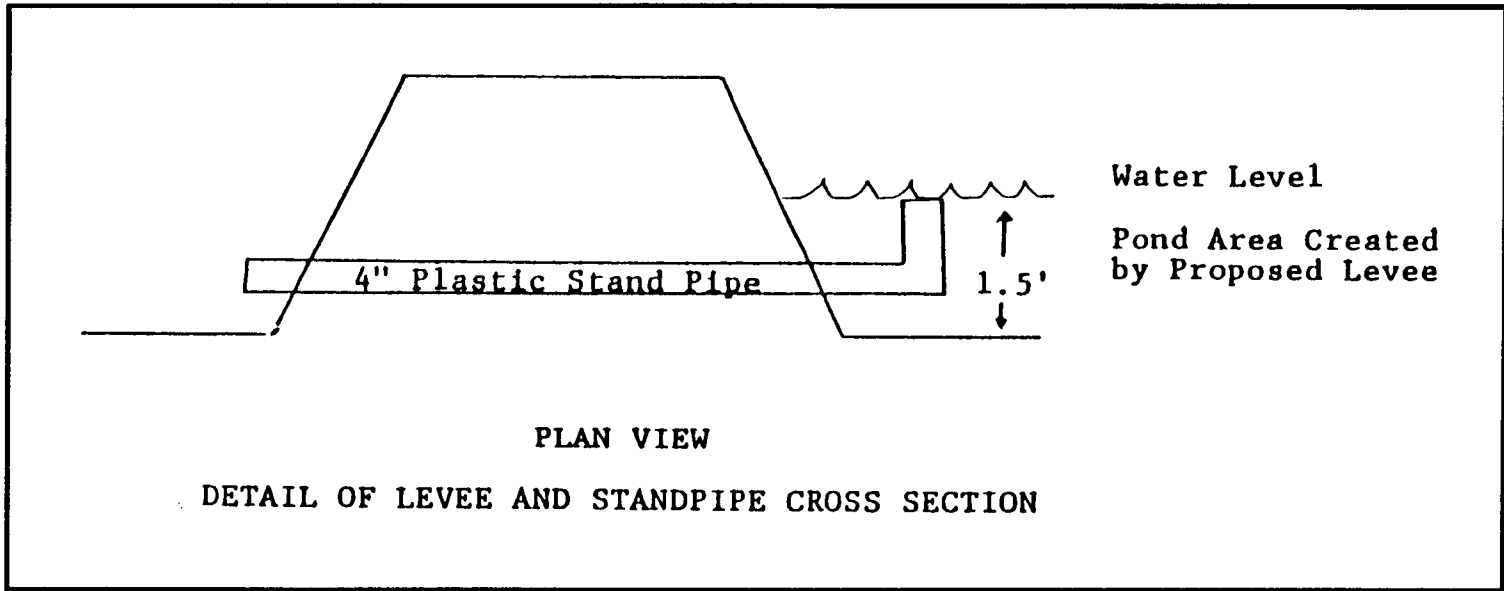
Culvert with L-shaped riser: detail of levee and standpipe cross section (adapted from Benoit 1986).
